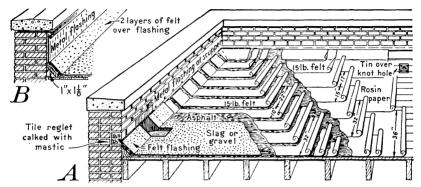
A, Five-ply built-up roofing; B, detail of flashing under coping.
